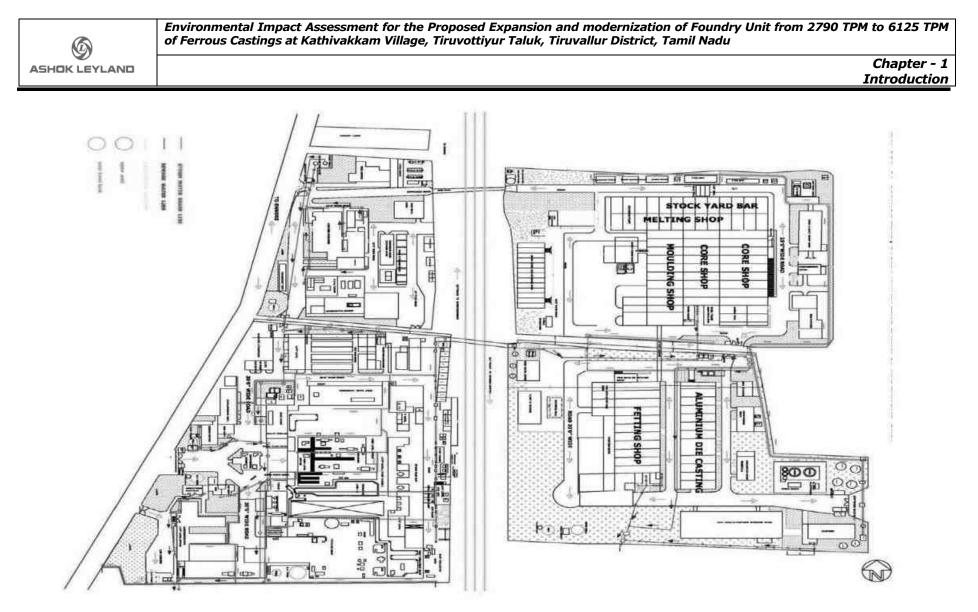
LAYOUT OF THE PLANT SITE
